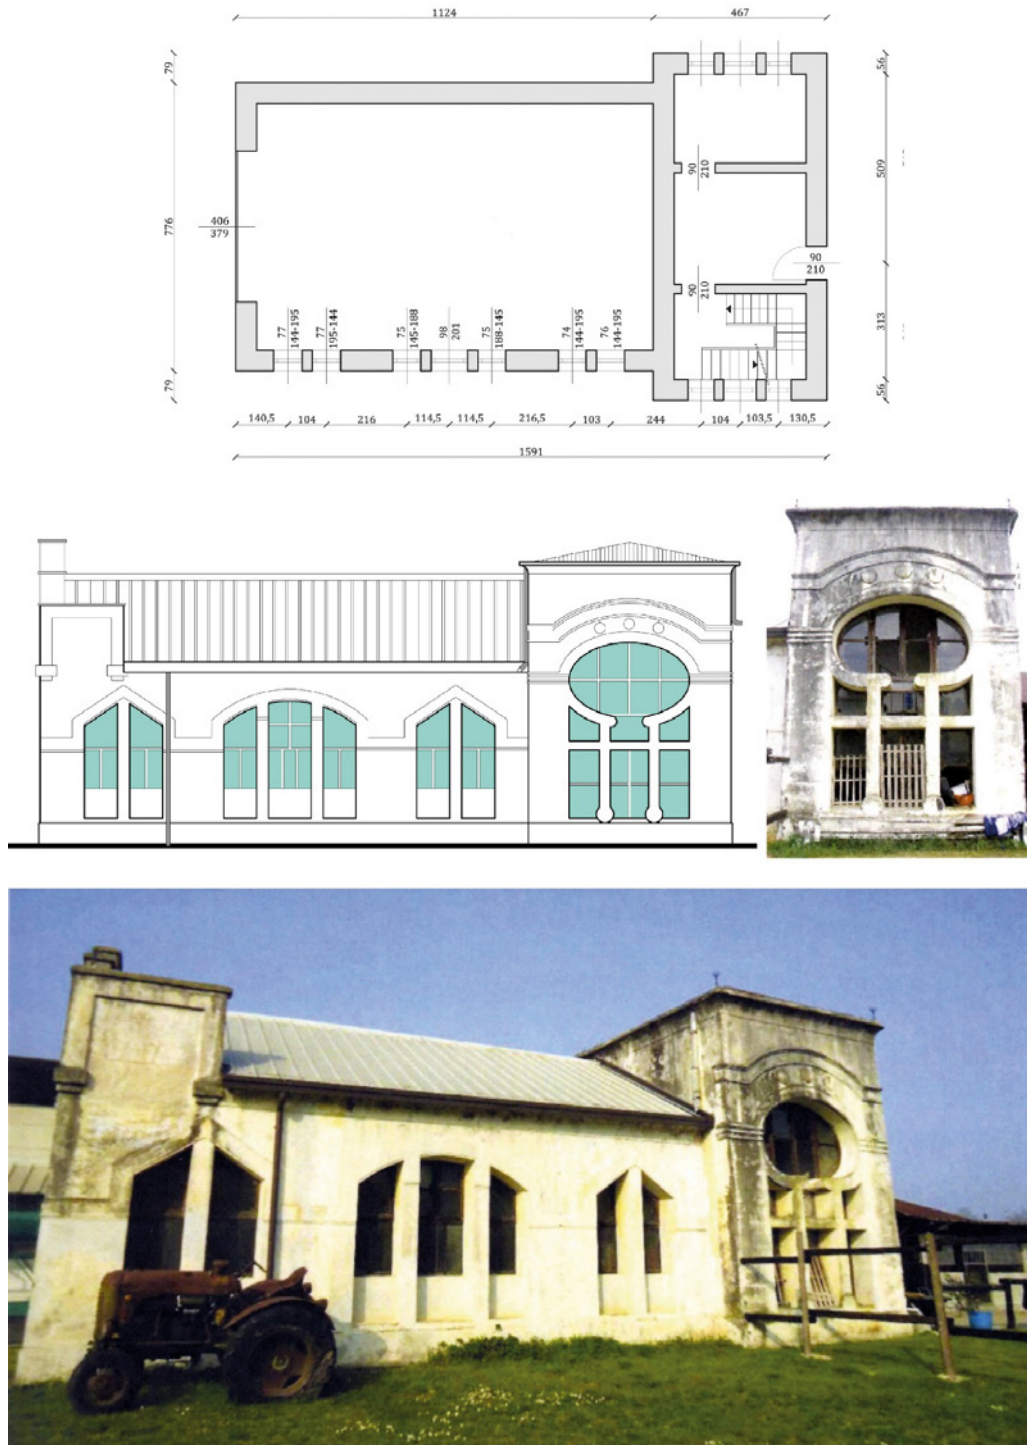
San Foca power plant. Bottom: first level plan. Centre: southern elevation and “mushroom” window detail © F. Chinellato, L. Petriccione.
